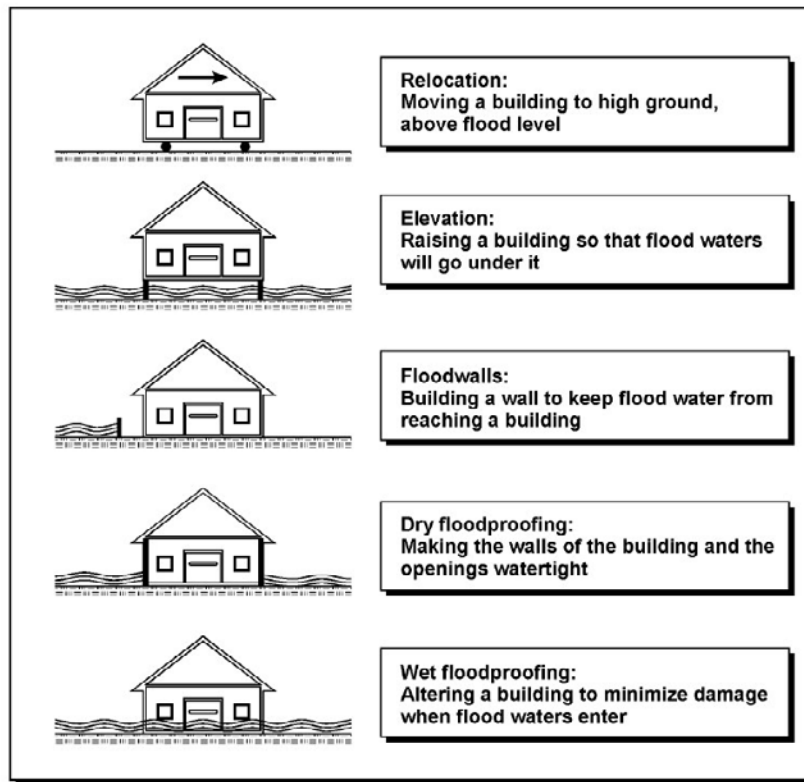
Example of flood proofing (UNESCO, 1995)
